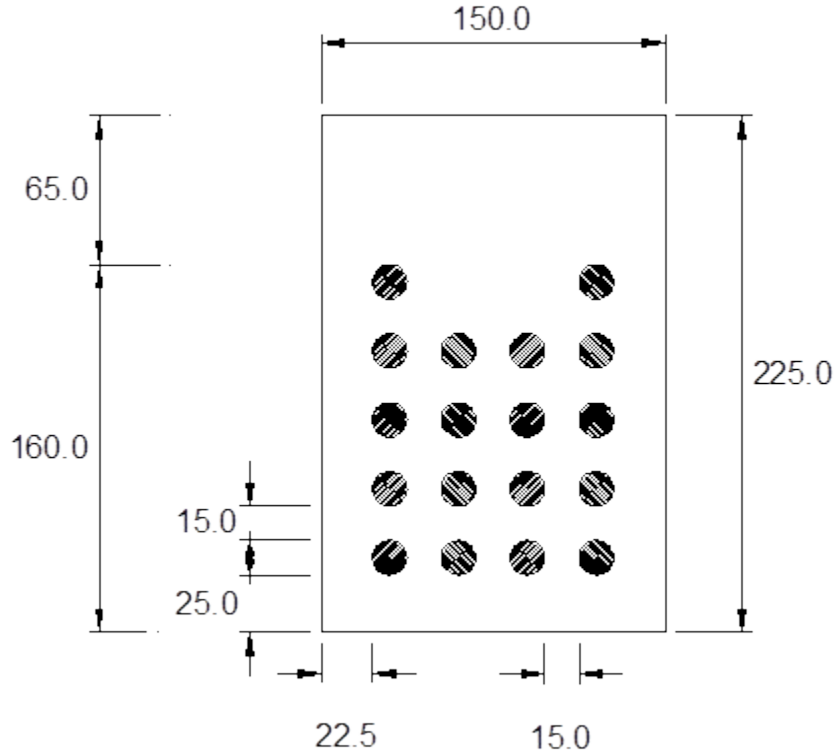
Practical arrangement of rebars corresponding to $\rho_b = 10.6\%$ in a UHPC beam cross-section.
